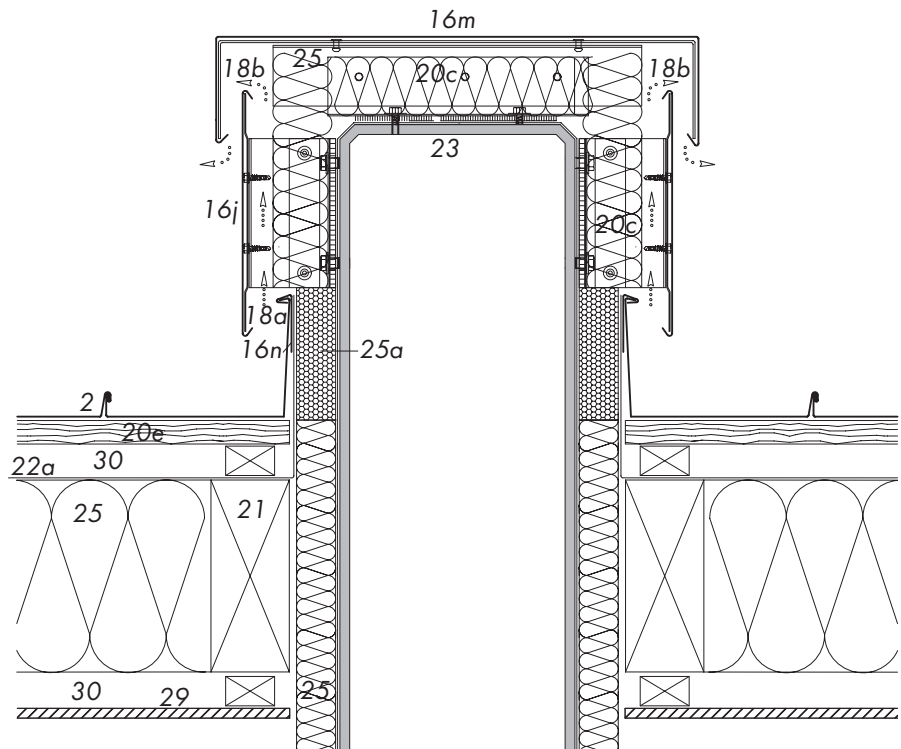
Suggested design for a fire wall with RHEINZINK made of class A building materials
